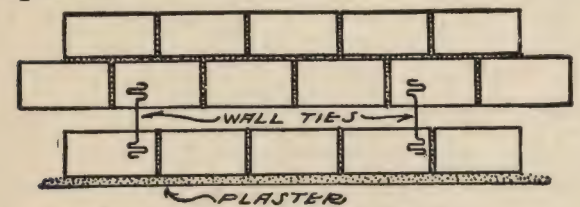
Brick Wall With Air-Space. Horizontal section of hollow brick wall, 8 in. outside and 4 in. inside, with a 2-in. air-space, bonded with metal wall-ties every fifth course of brick. Since no moisture can penetrate through such a wall across this air-space, the plaster can be applied directly to the inside face of the wall without the use of furring.
